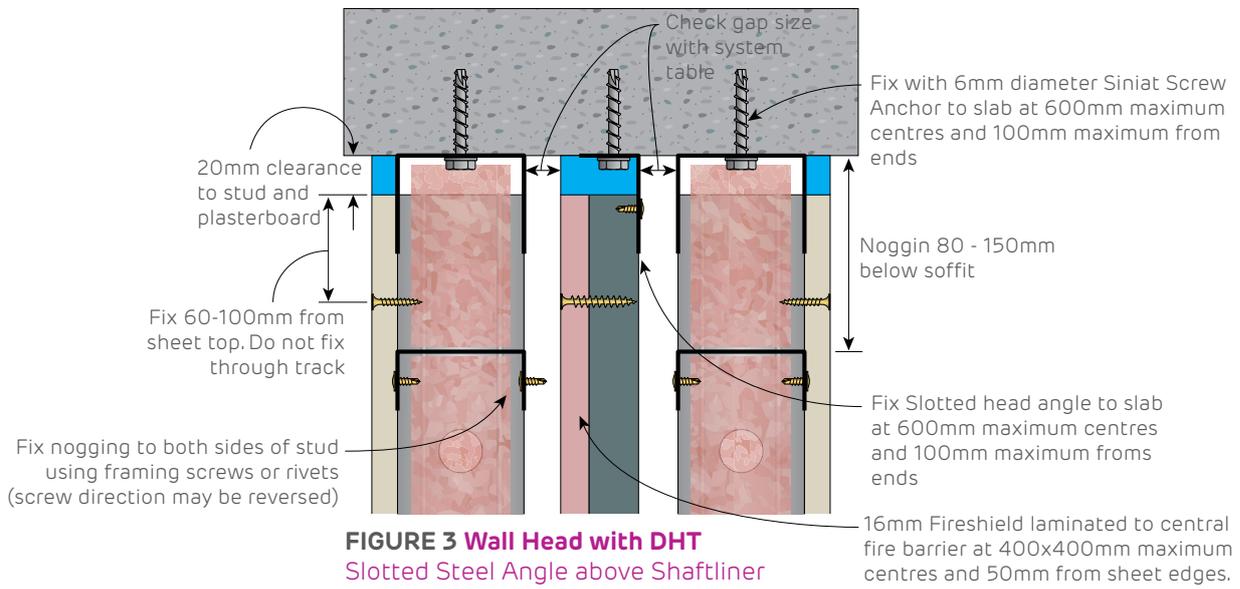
Wall Head with DHT Slotted Steel Angle above Shaftliner Section
